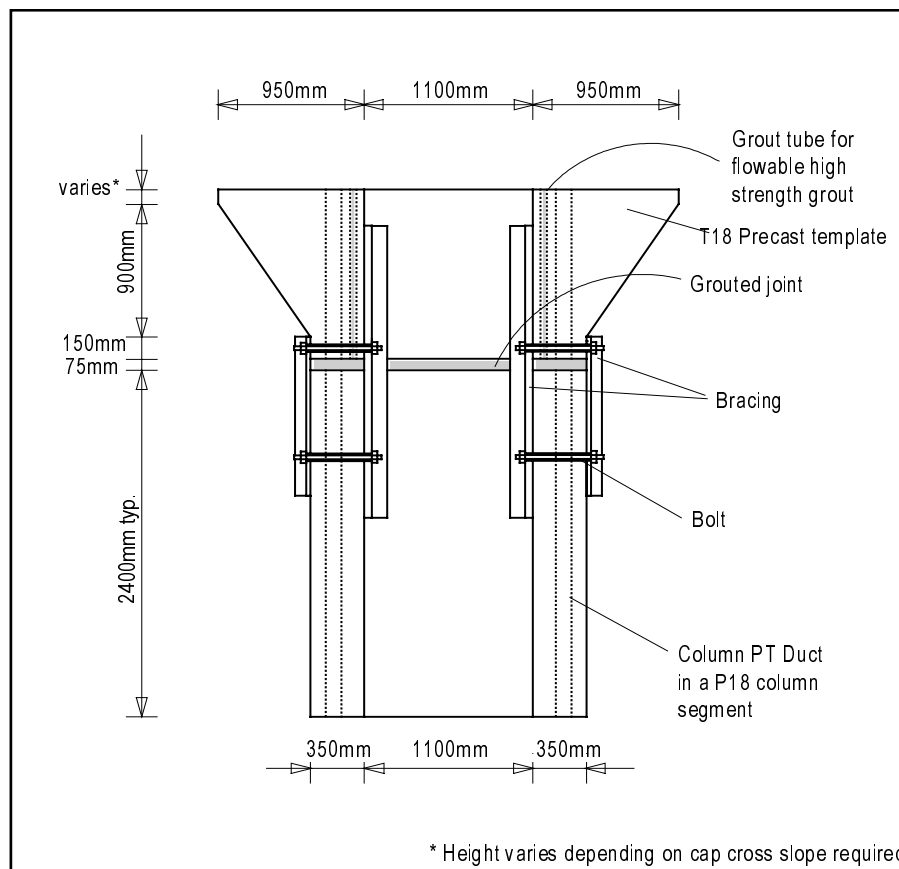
Cross-section through a P18 pier showing grouting of the template to the top column segment
